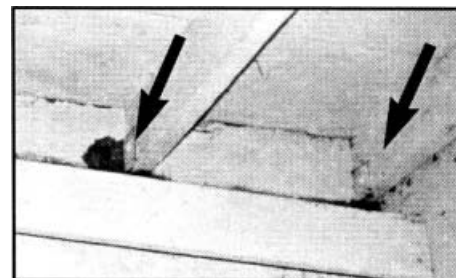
Shed roof rafters, west wall, first-floor level. Steel clips are welded to the channel sections bolted to each of the shed roof rafters.
